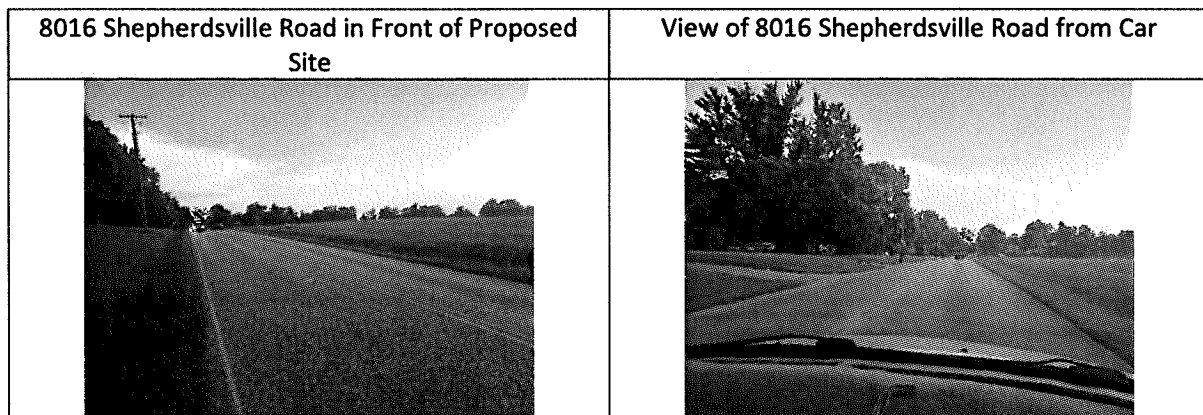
Shepherdsville Road in Front of Proposed Unity Place Apartments
